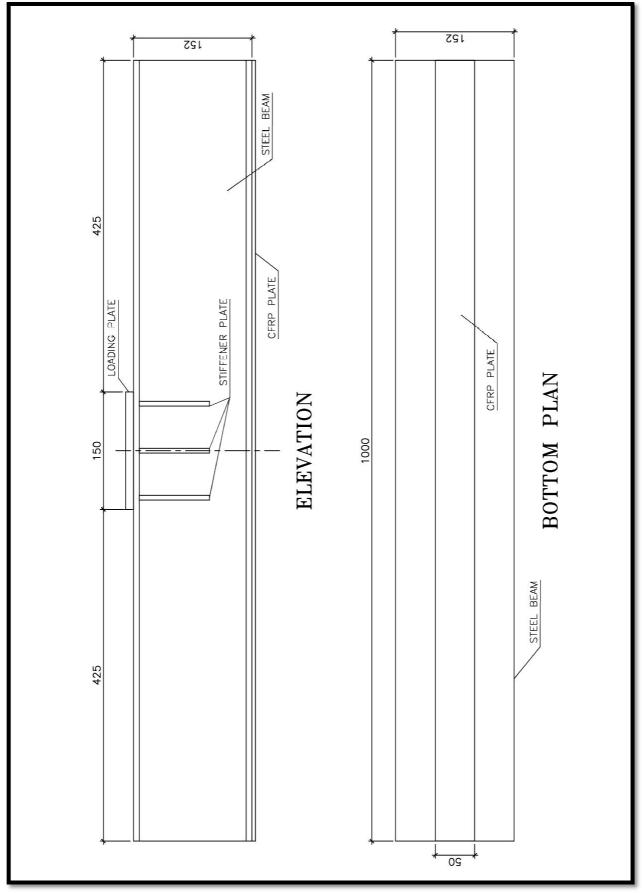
Details of Strengthened Test Beams without End Anchorage. (Beam 2, Beam 4, Beam 5 and Beam 6)
